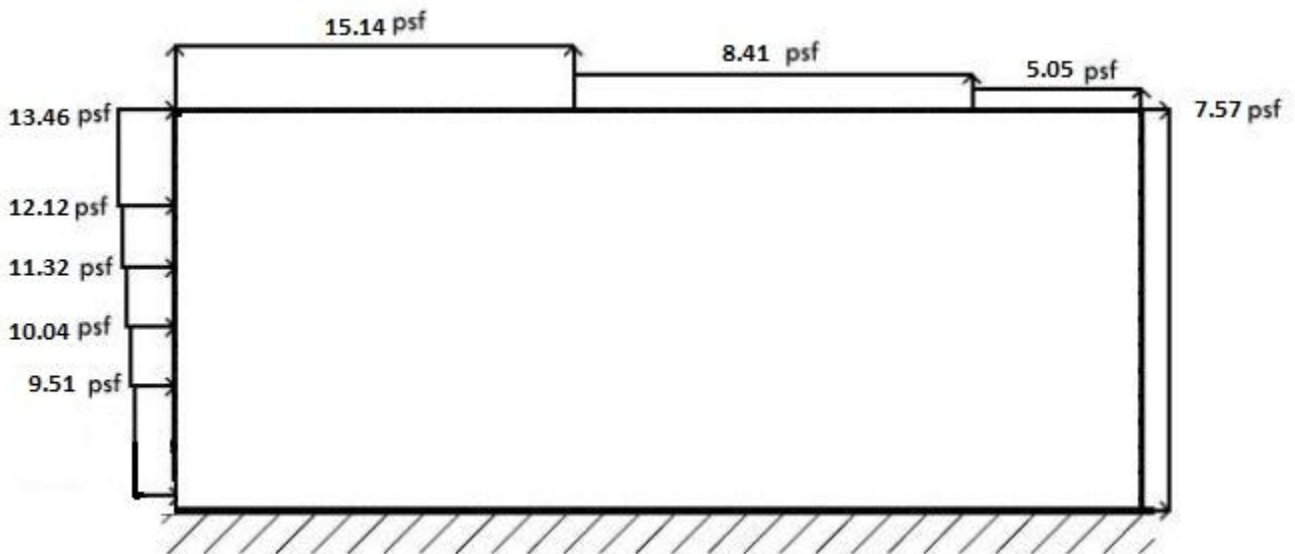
Wind Pressures acting on the West Wing, East and West facades
